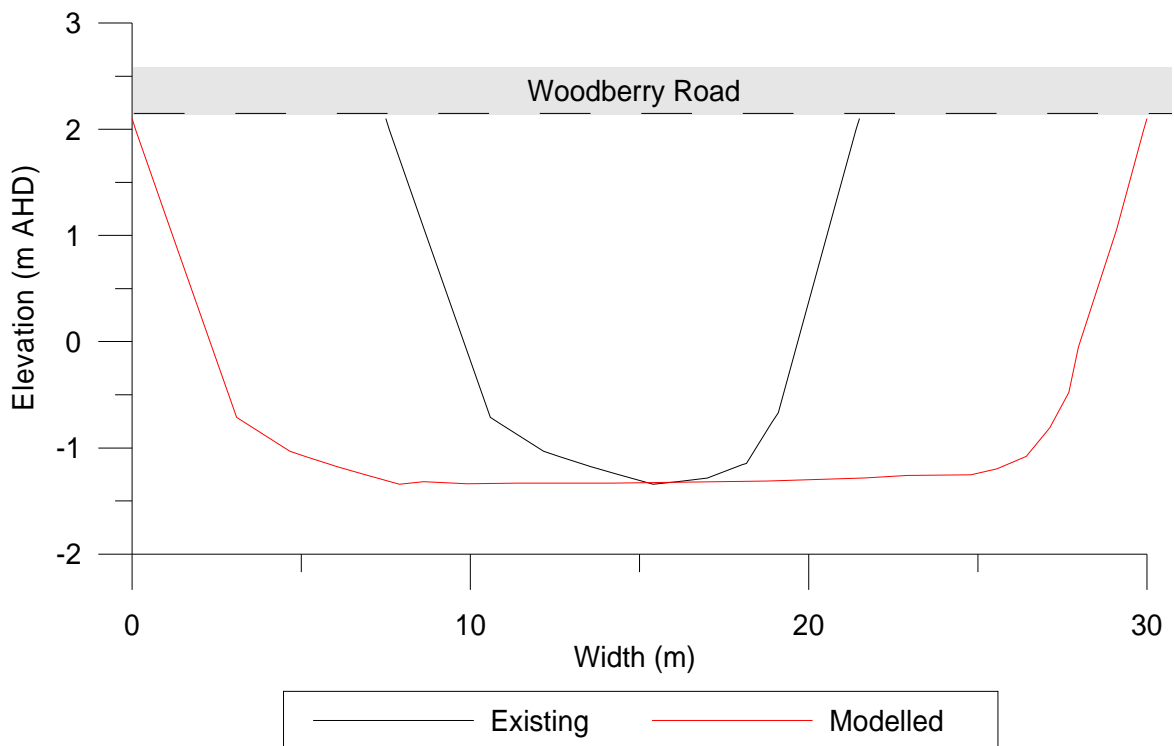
Modified channel cross-section beneath Woodberry Road
